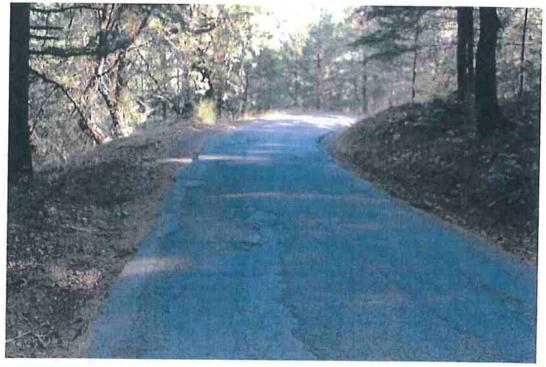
Mile 3.85: Blind corner at intersection with Lower Thomas Road. 16-ft road width with 1-ft shoulders. Potential location to widen corner on inside to improve visibility.
